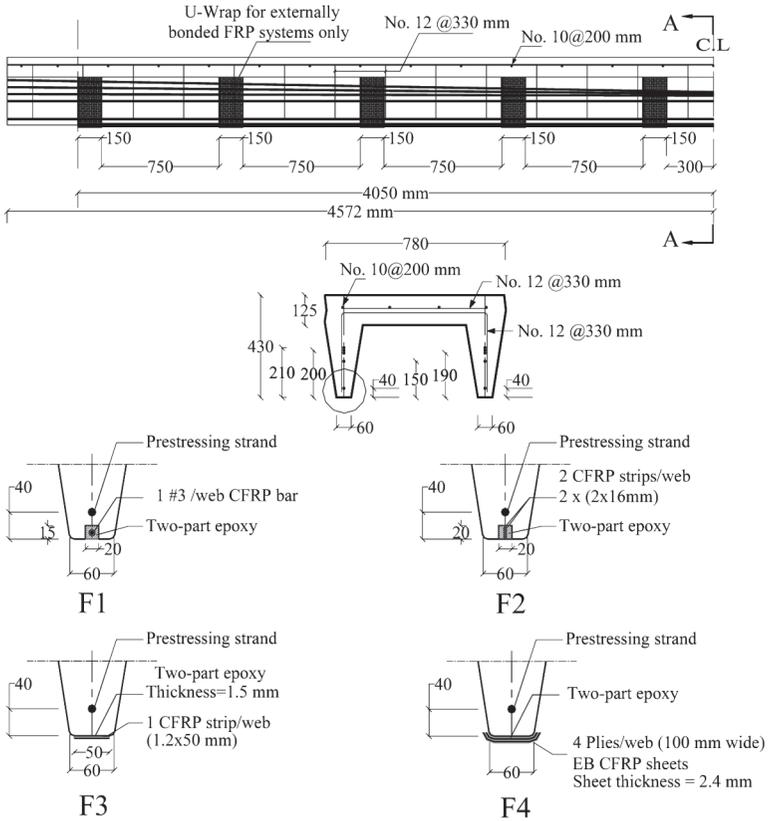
Reinforcement and strengthening details of the C-Channel girders
